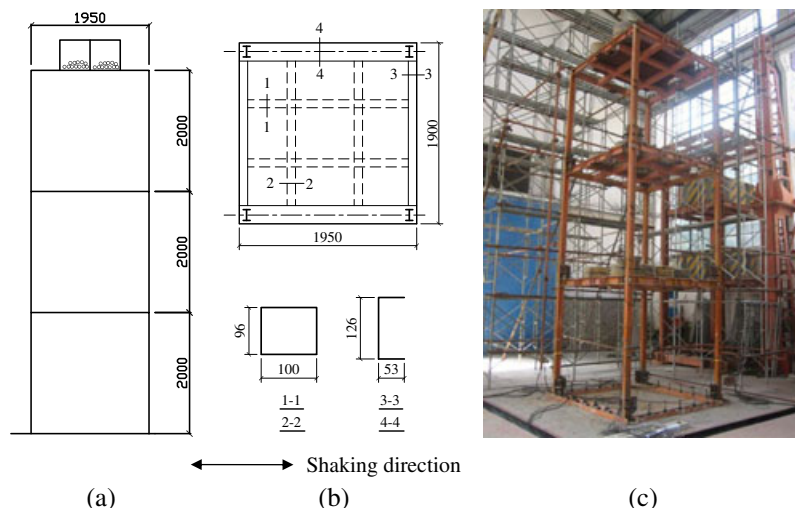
Configuration of frame model with multi-unit particle dampers (unit: mm). (a) Elevation; (b) floor plan; and (c) photo of the experimental model.
